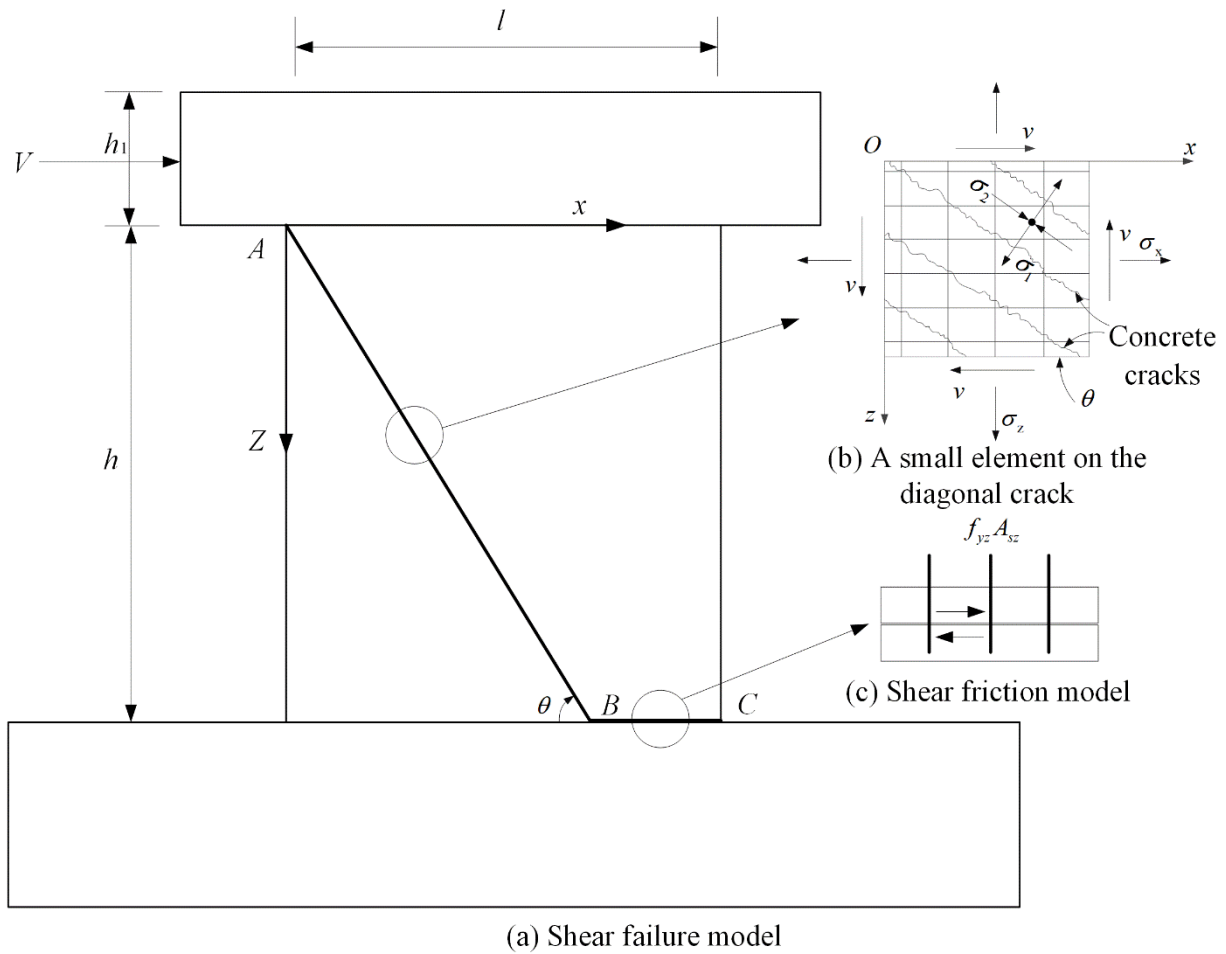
Failure mode of low-rise reinforced concrete walls under lateral loading
